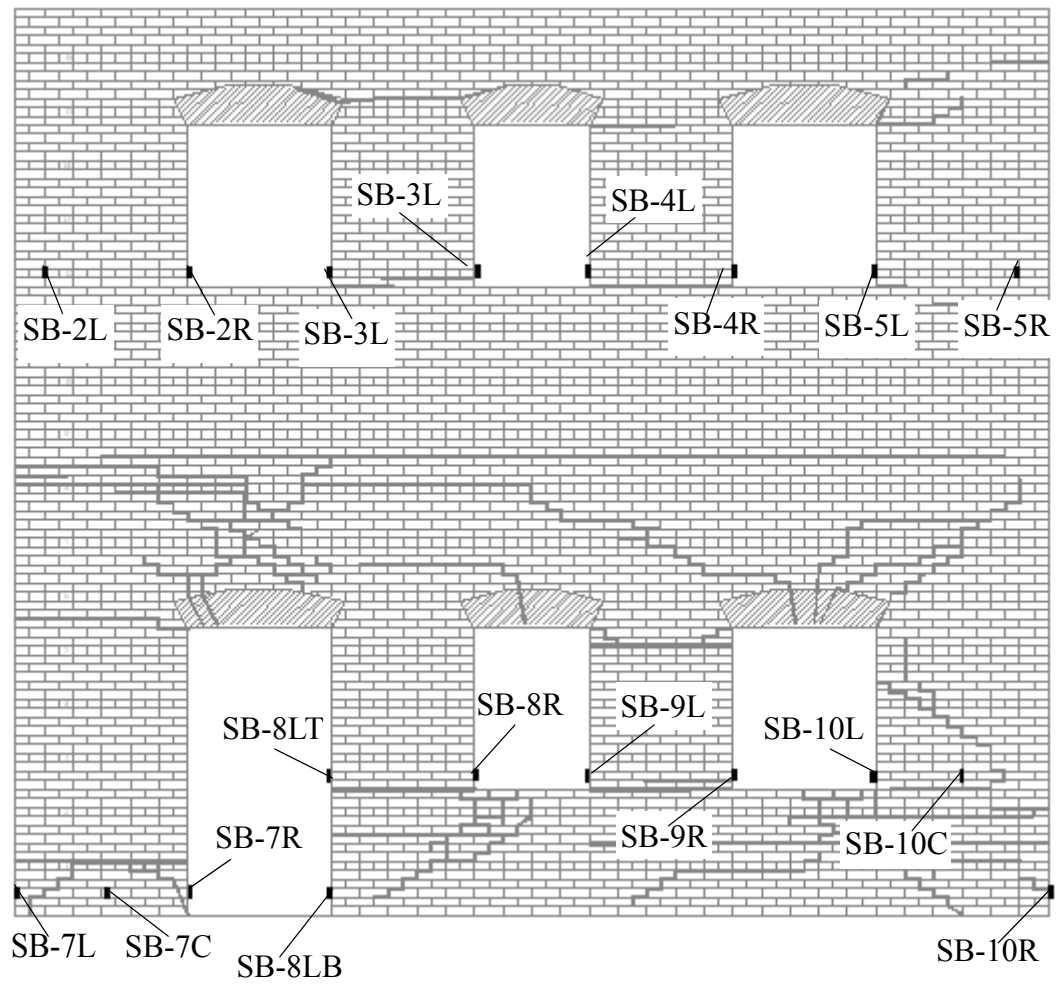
Elevation of Wall B illustrating the location of strain gages.
